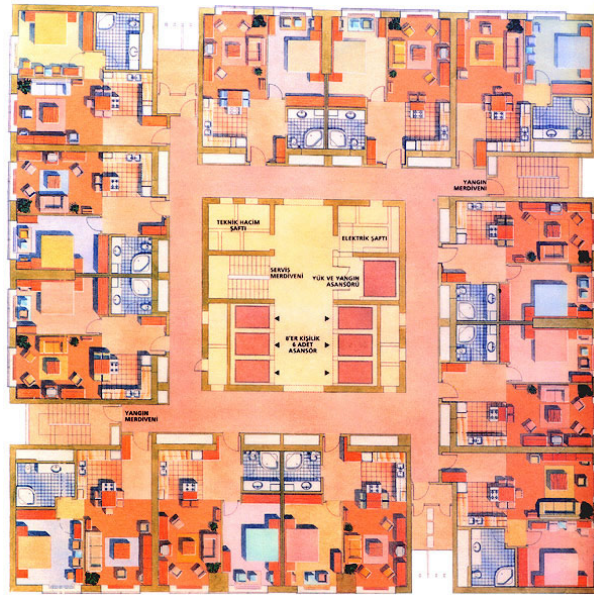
Typical Floor Plan (Source: <http://www.polatinsaat.com>)
